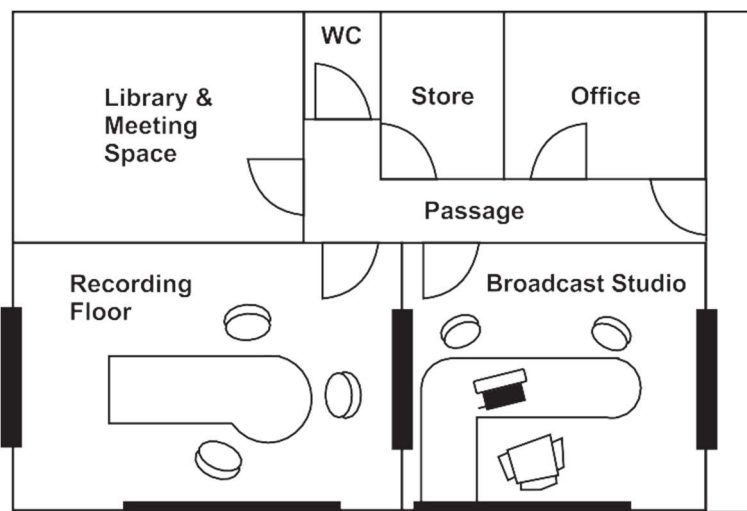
This layout allows us to house a reception area where we can greet guests, as well as an office.
